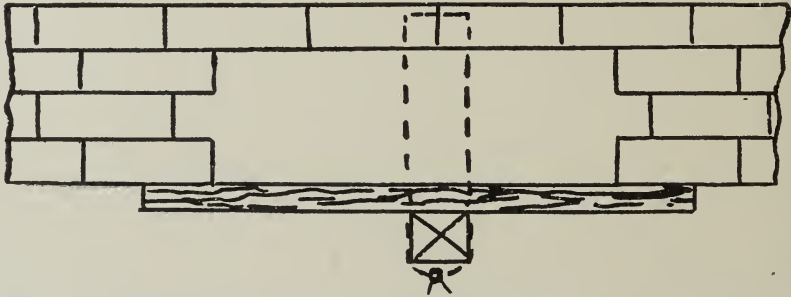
Single Wood Form Shutter for Concrete Column in Brick Outside Wall.
